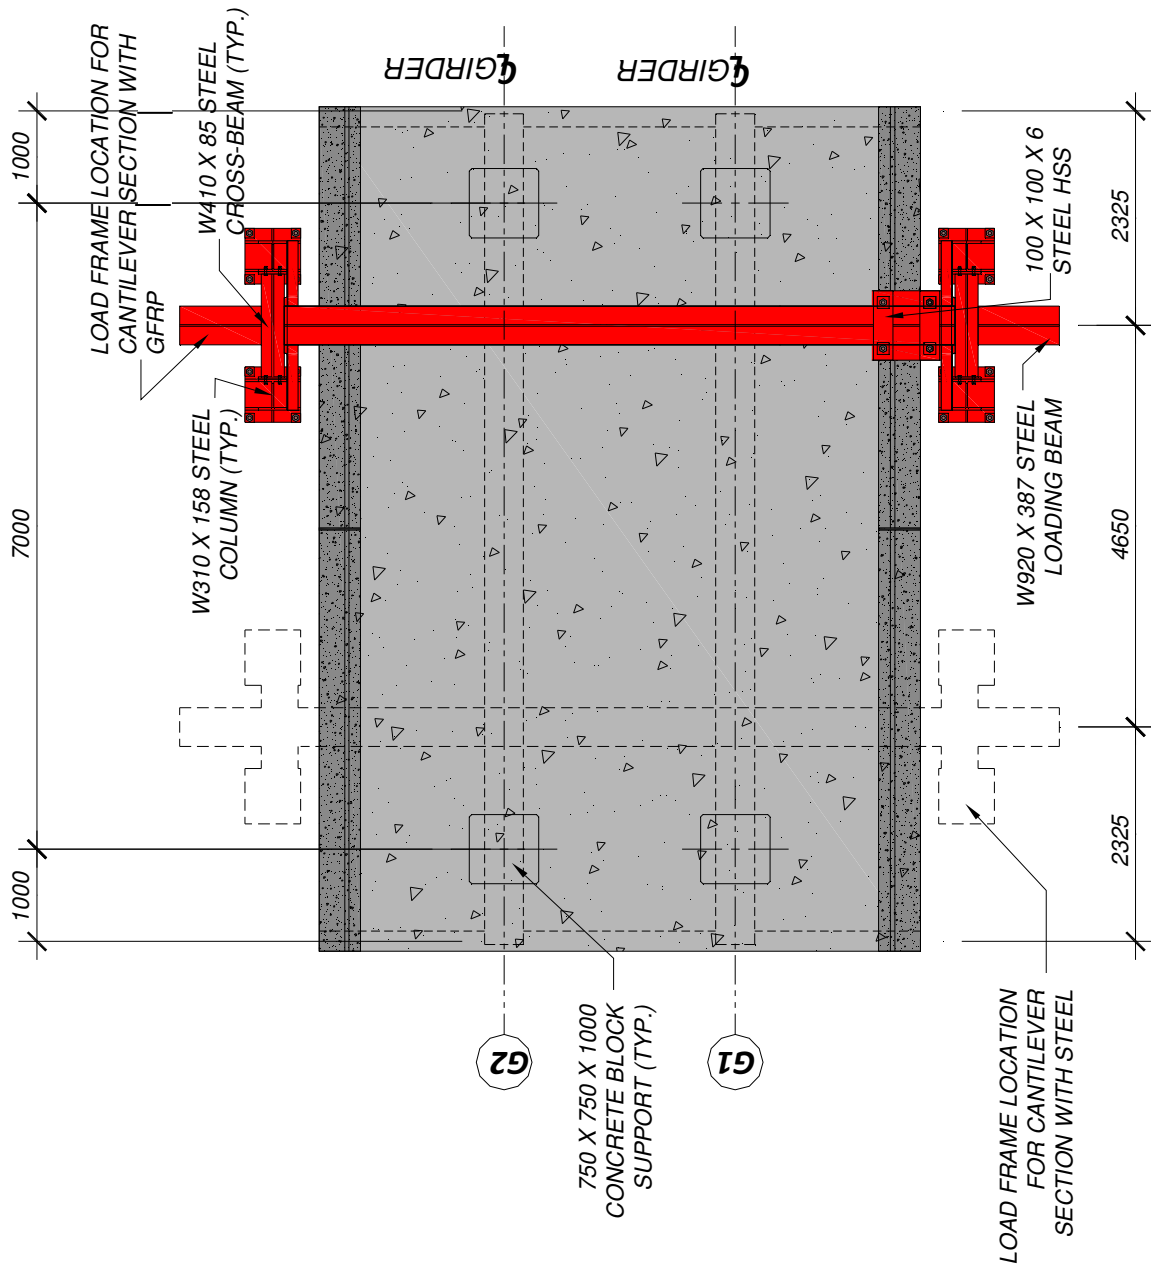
(a): Plan view of full-scale test set-up illustrating superstructure support and load frame
